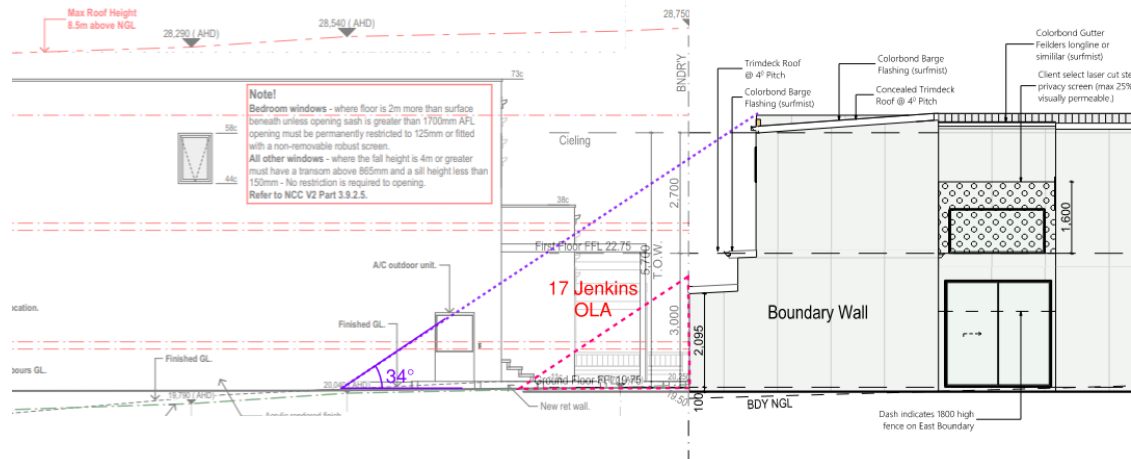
Overshadowing Diagram. Pink dashed line shows hypothetical overshadowing from boundary wall. Purple dash line shows actual overshadowing from second storey to the outdoor living area (OLA) of 17 Jenkins Avenue.
